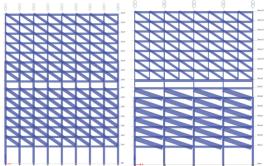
Elevation of Building Model-2 along y-dir. Fig 7: Elevation of Building Model-2 along x-dir.
